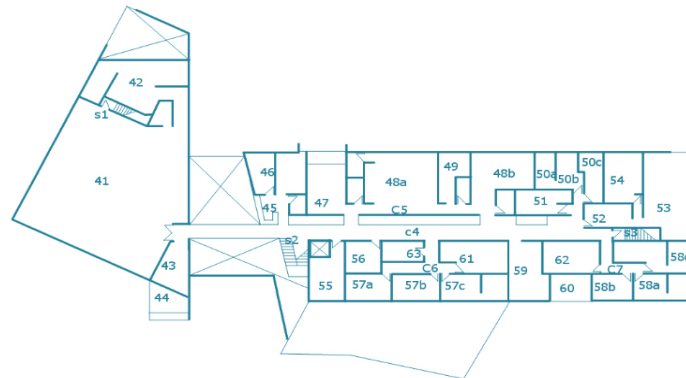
First floor plan of homeless shelter, redrawn based on images retrieved from archdaily.com.
